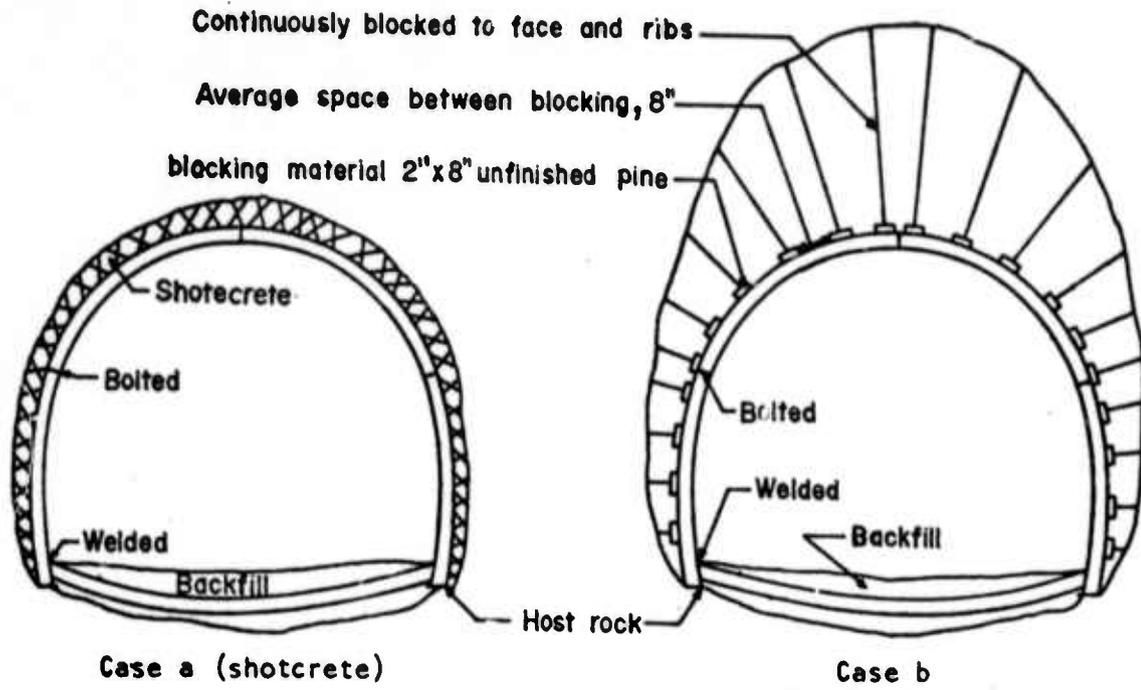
Tunnel Excavation and Support Blocking Configuration.
